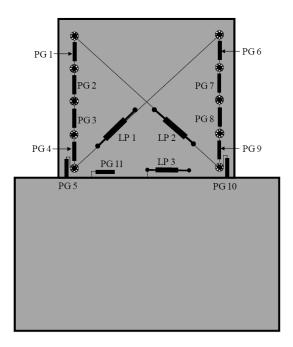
Instrumentation layout (The lowest rosettes are 50mm away from the beam end. The vertical distance between other rosettes was 100mm)
